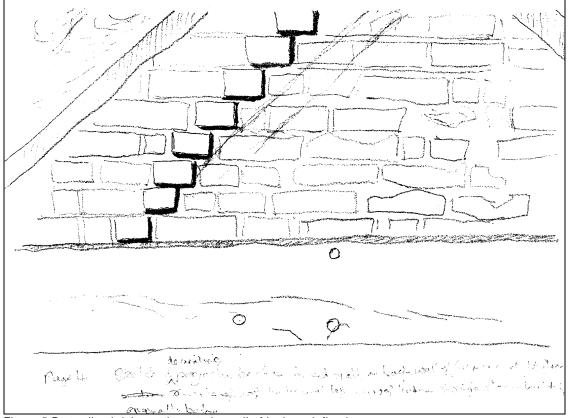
Protruding bricks on the exterior wall of inglenook fireplace
